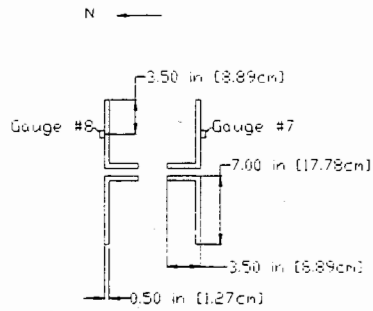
Gauges 7 and 8; 70.5 in (179.07 cm) west of centerline of floorbeam
